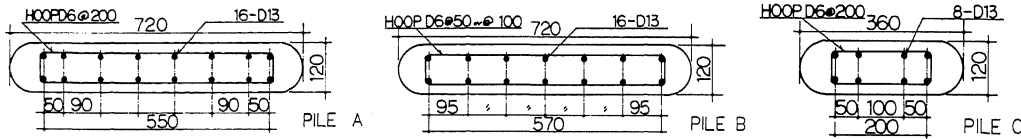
Cross Section and Reinforcing Bar Arrangements of Test Piles
